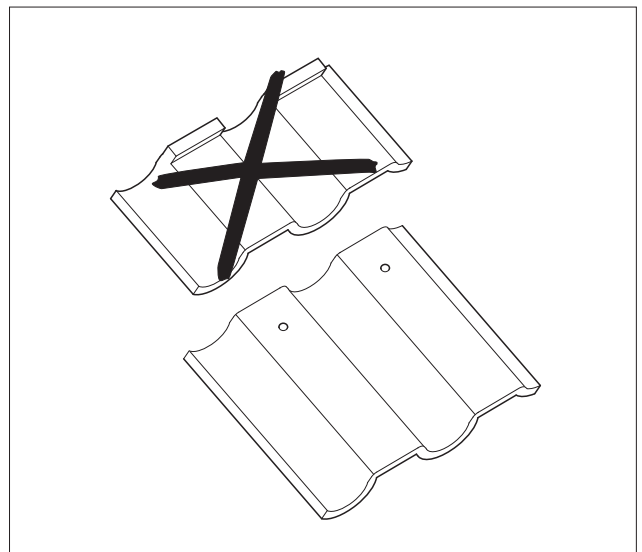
Roof tiles above the collectors may have to be cut to size. Drill holes into the pieces that have to be attached, and screw to battens.
